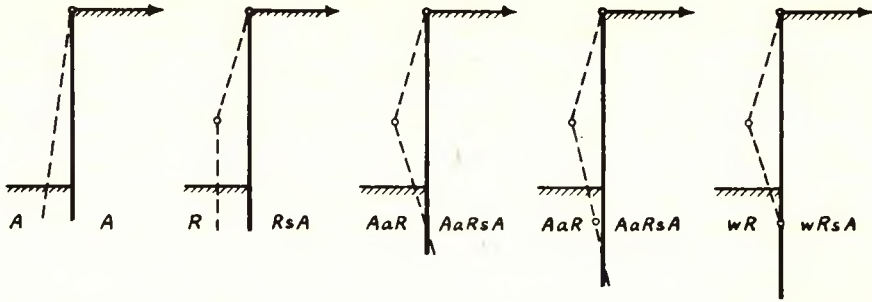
M: Anchored sheet wall. States of failure for different driving depths, smooth wall.
